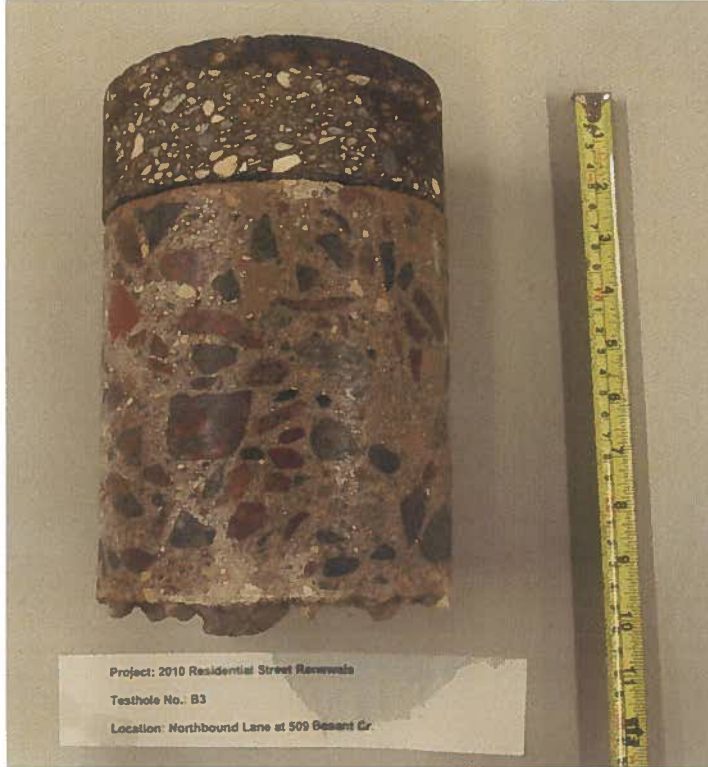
Test Hole B3: 509 Besant Cres., Northbound Lane, 115 m S of S Munroe sidewalk, 1.9m E of W curb
